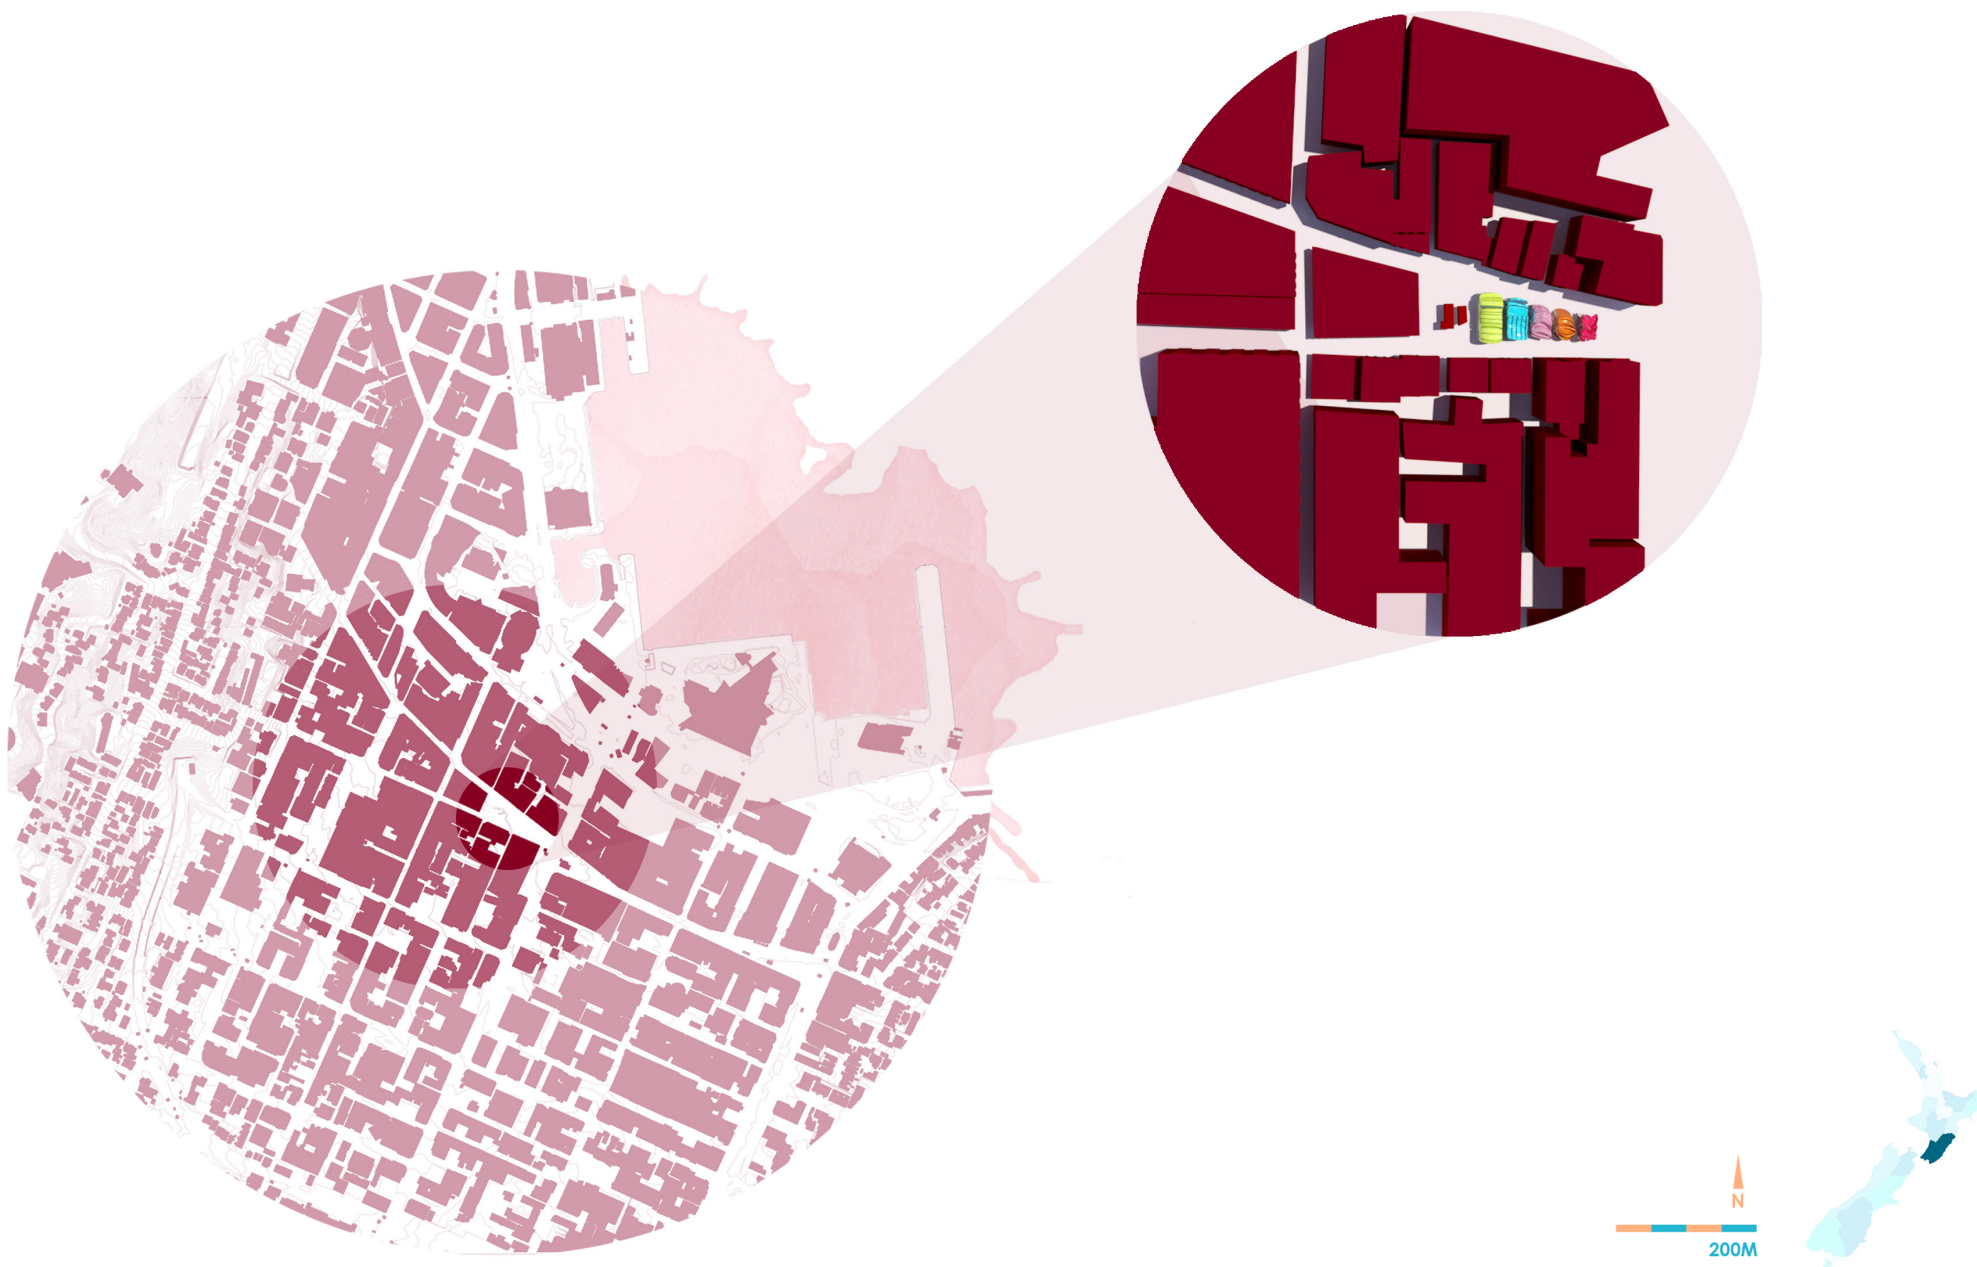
Site Plan of Te Aro Park, Wellington where The Playce is situated
